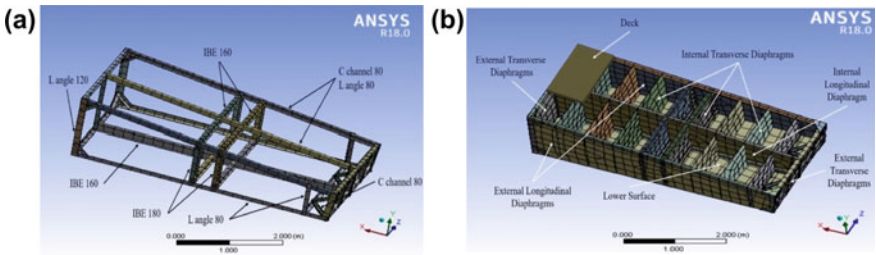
a HNCP internal steel structure, b HNCP deck and CFRP sheets
